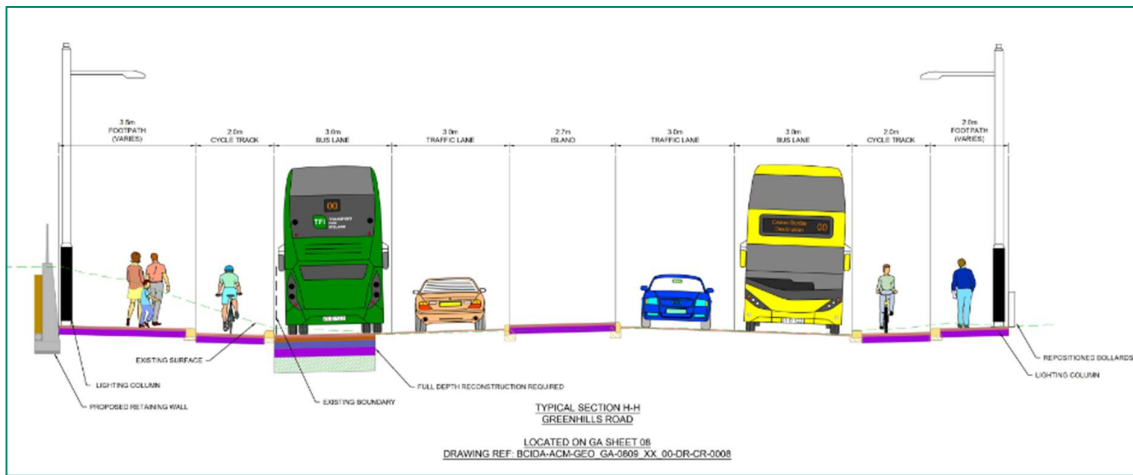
Typical Cross-section adjacent to MXF Properties
